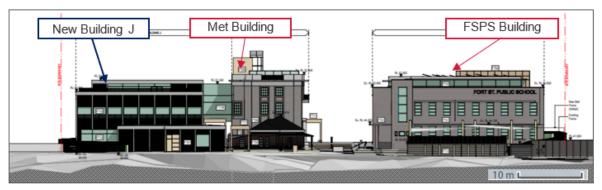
| Eastern elevation (Source: Applicant's RtS 2020)
